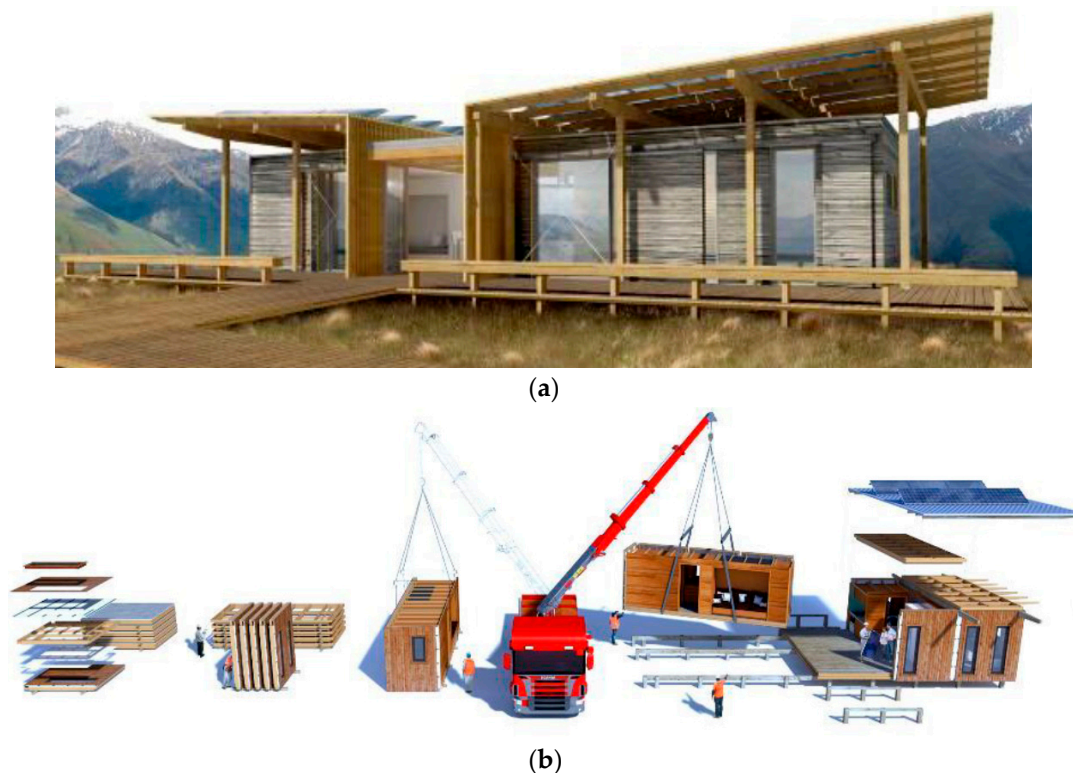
Hybrid structure—First Light House: completely installed building (a) and installation procedure (b).
